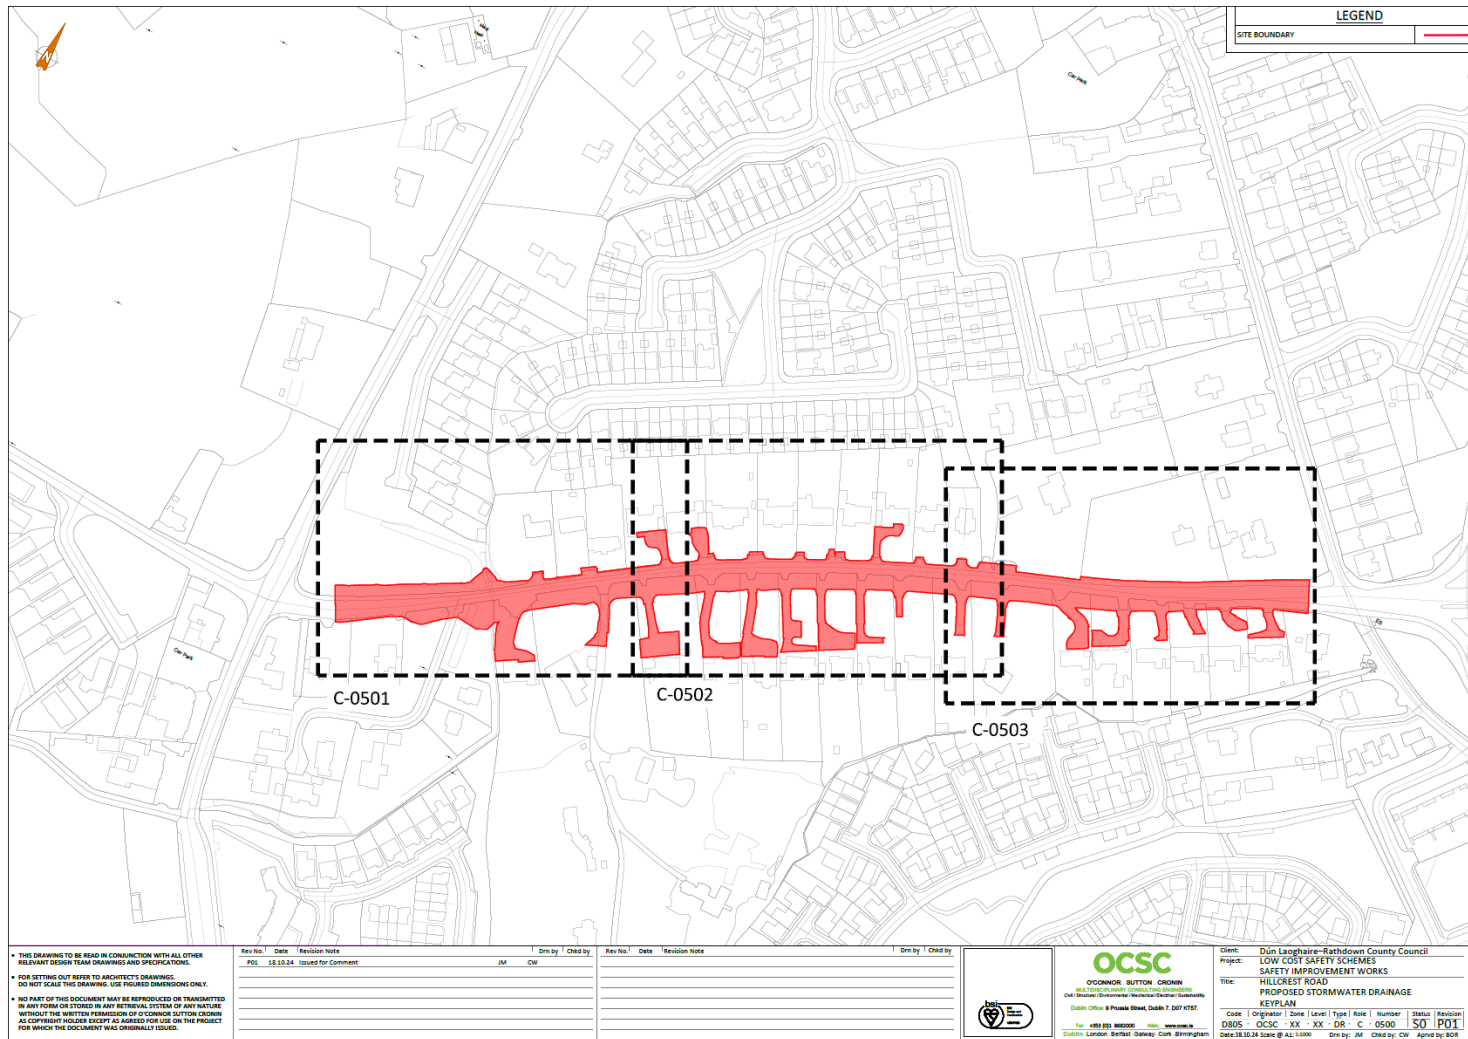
Hillcrest Road Proposed Stormwater Drainage Key plan
